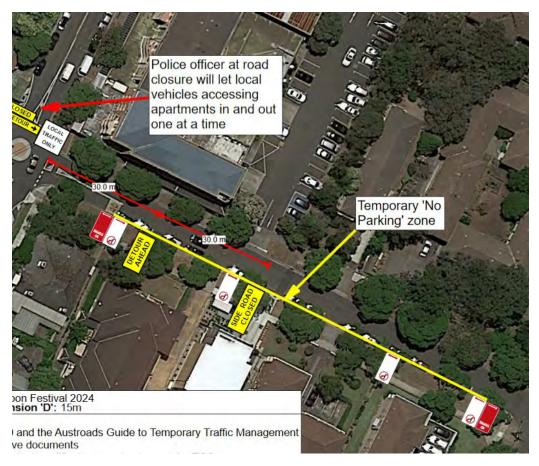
accessible area of Henley Road and 'No Parking' restriction on Exeter Road
